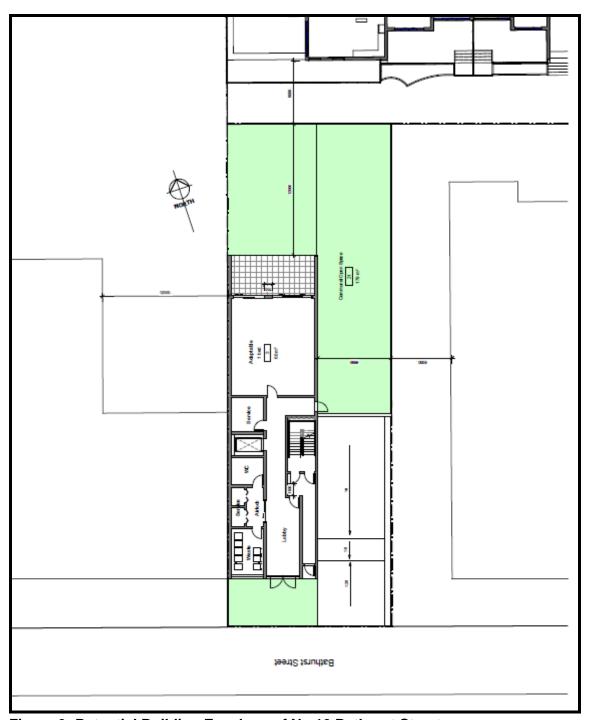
Potential Building Envelope of No.10 Bathurst Street
